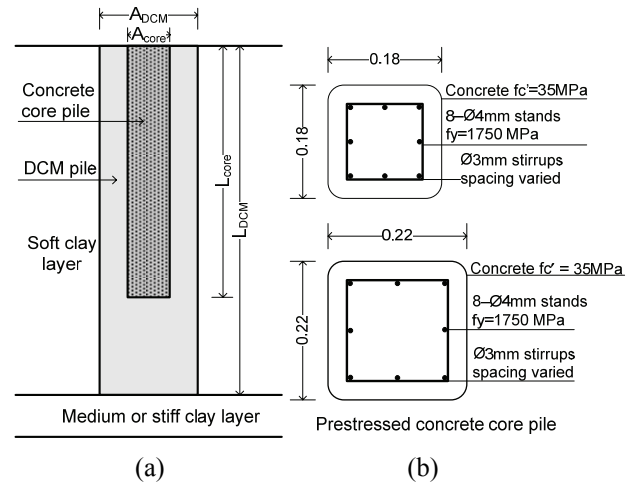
(a) Schematic of SDCM pile (b) Details of pre-stressed concrete core piles.
